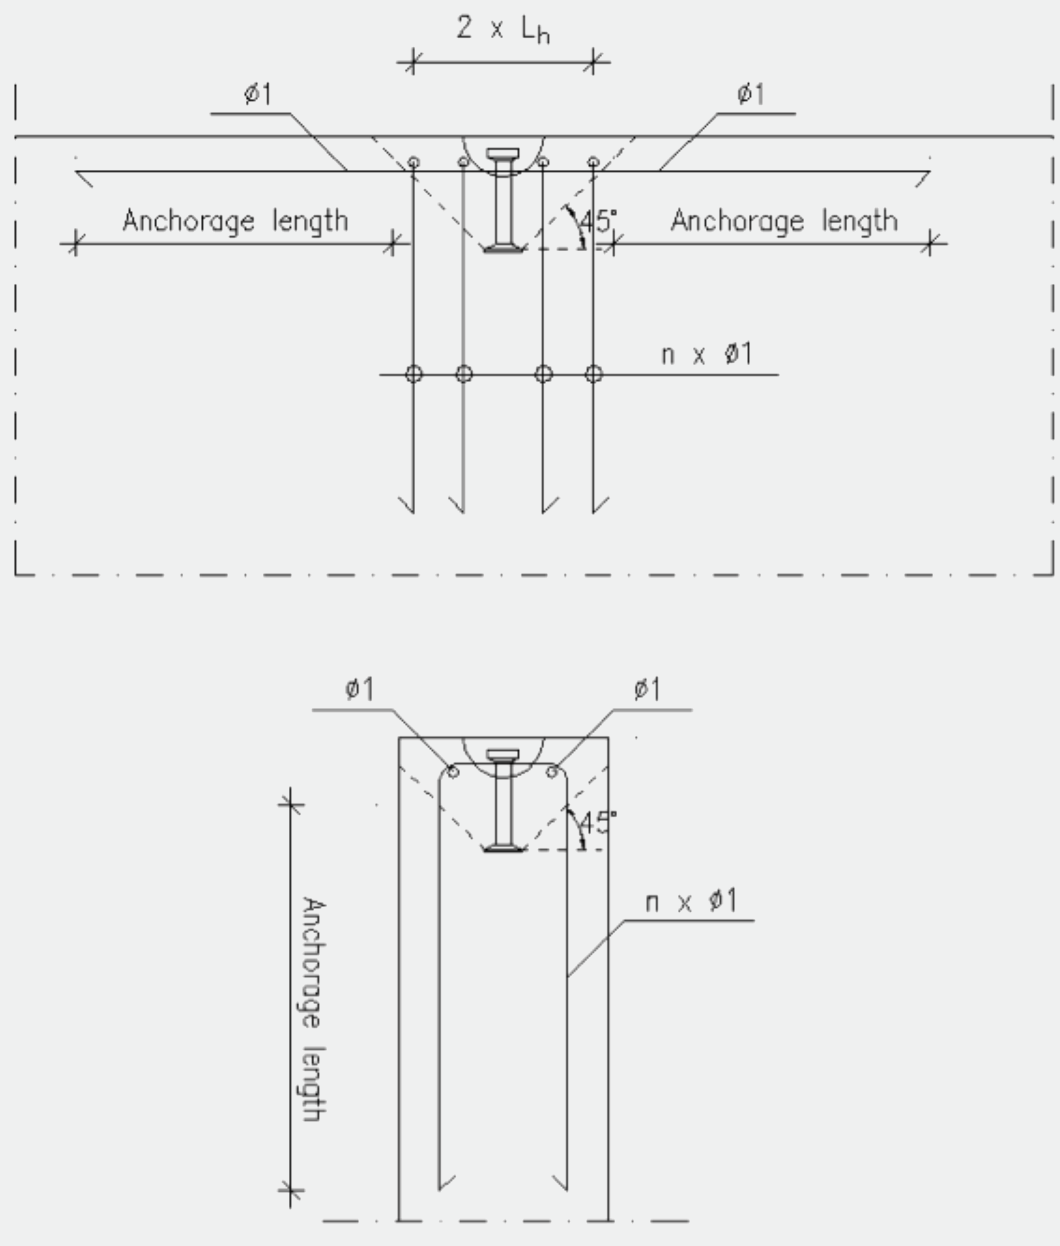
| Anchoring reinforcement in wall (see table 6)
